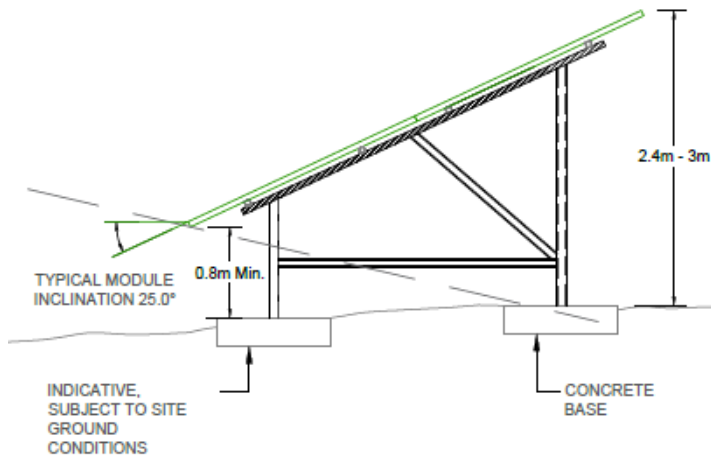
Typical Cross Section - Shallow Concrete Base Mounting System
